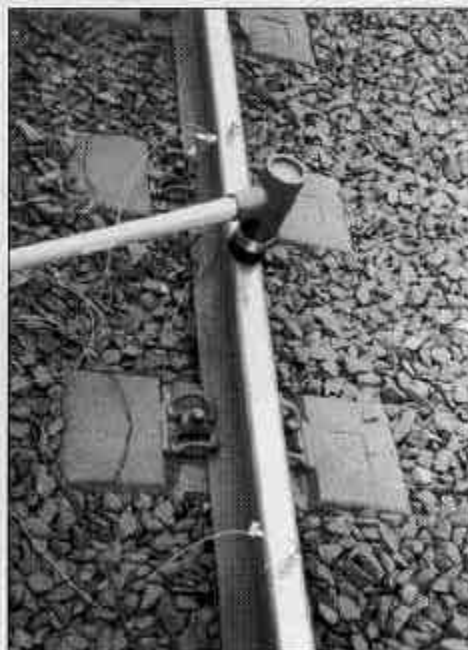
Large excitation hammer and accelerometers used on twin-block supported light rail track.
